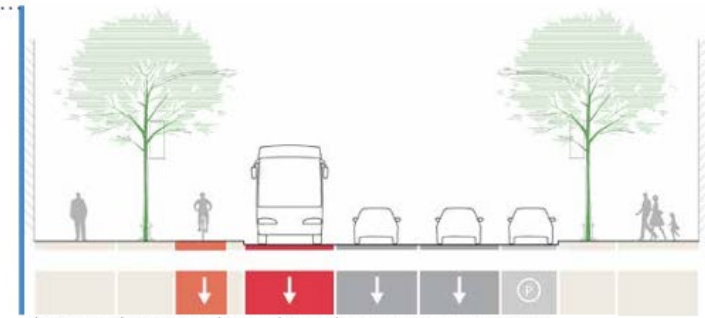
Fifth Street typical section Bowie Street to Guadalupe Street
